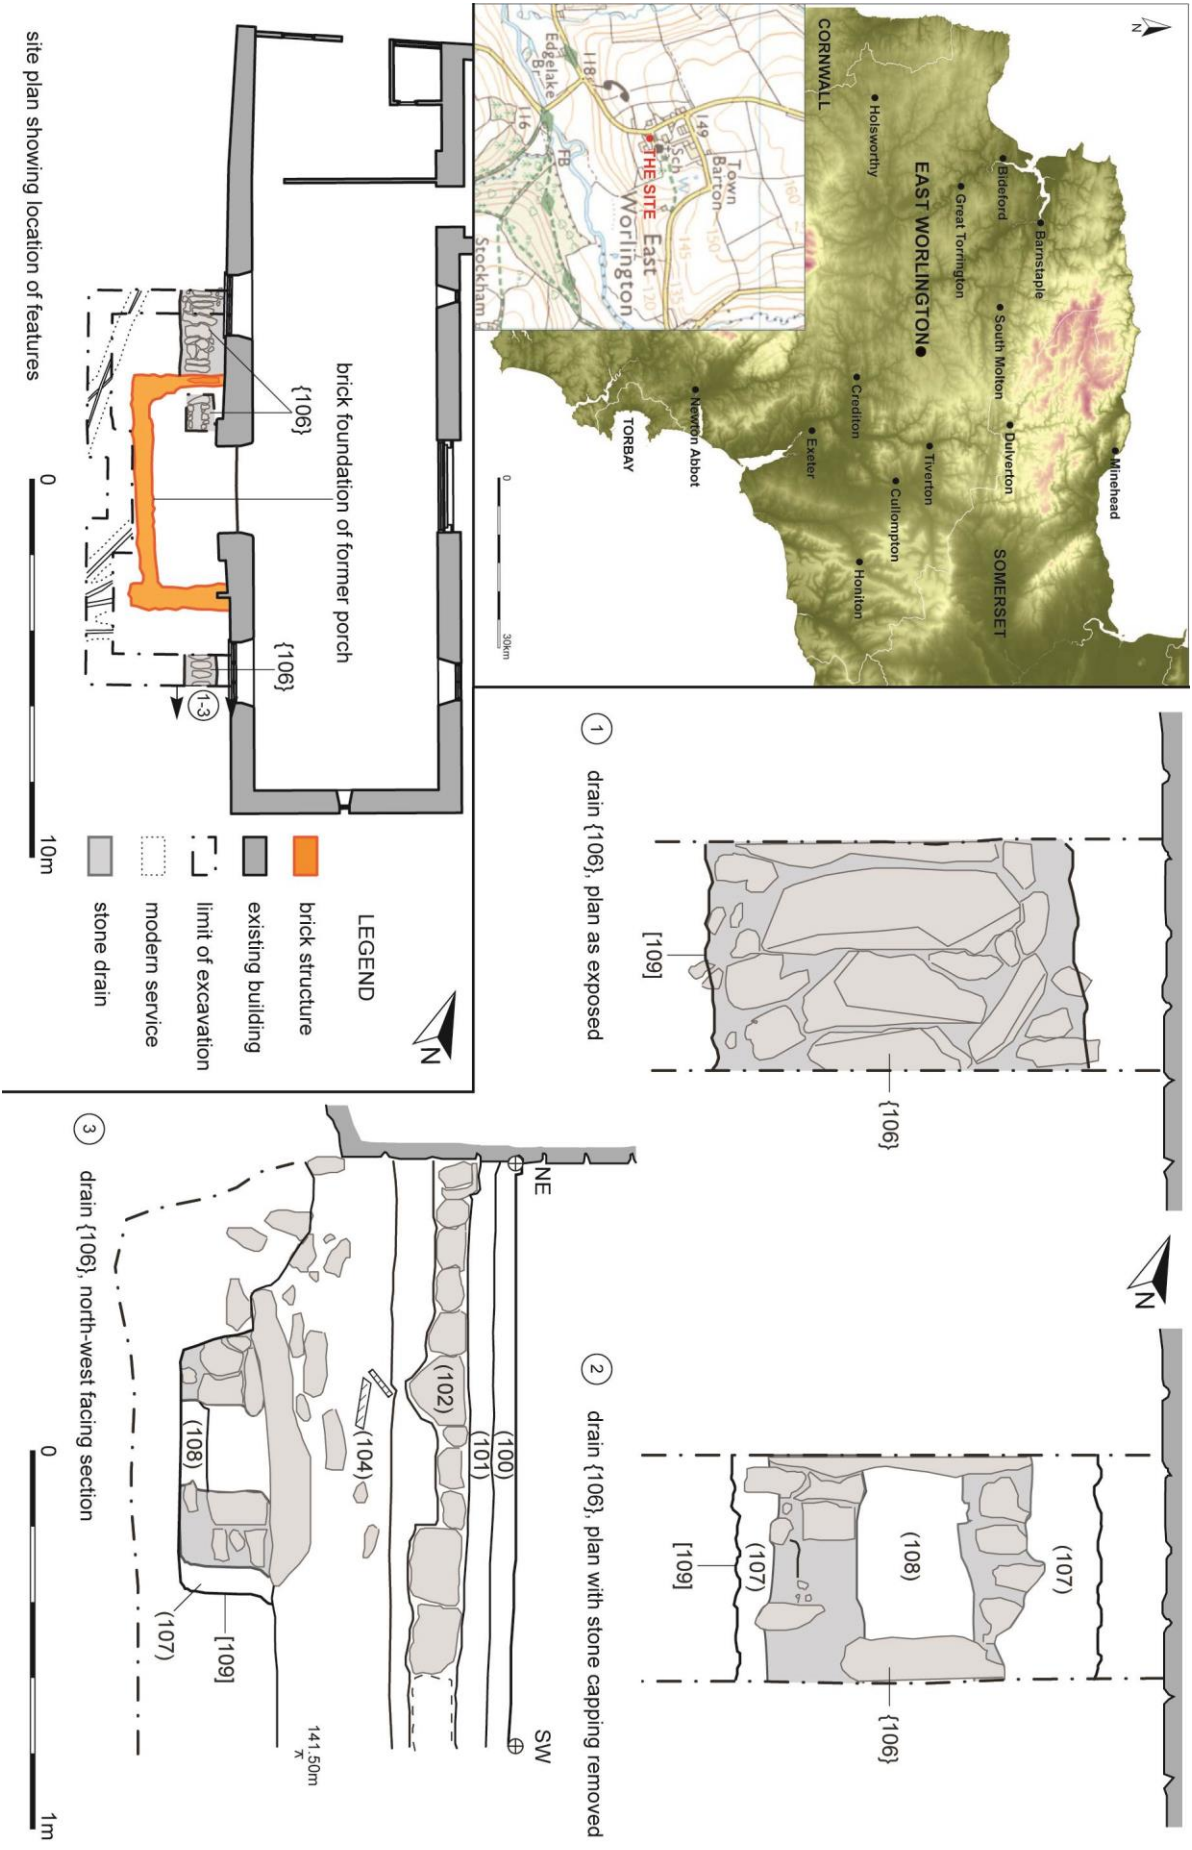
PLANS, SECTIONS AND LOCATION MAP.
